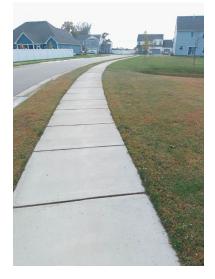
Sidewalk on the South side of Lot 8, Facing West
